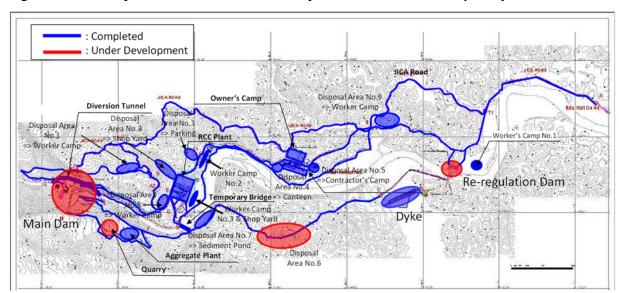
Plan of Site Access Roads with Major Work Area and Temporary Facilities
